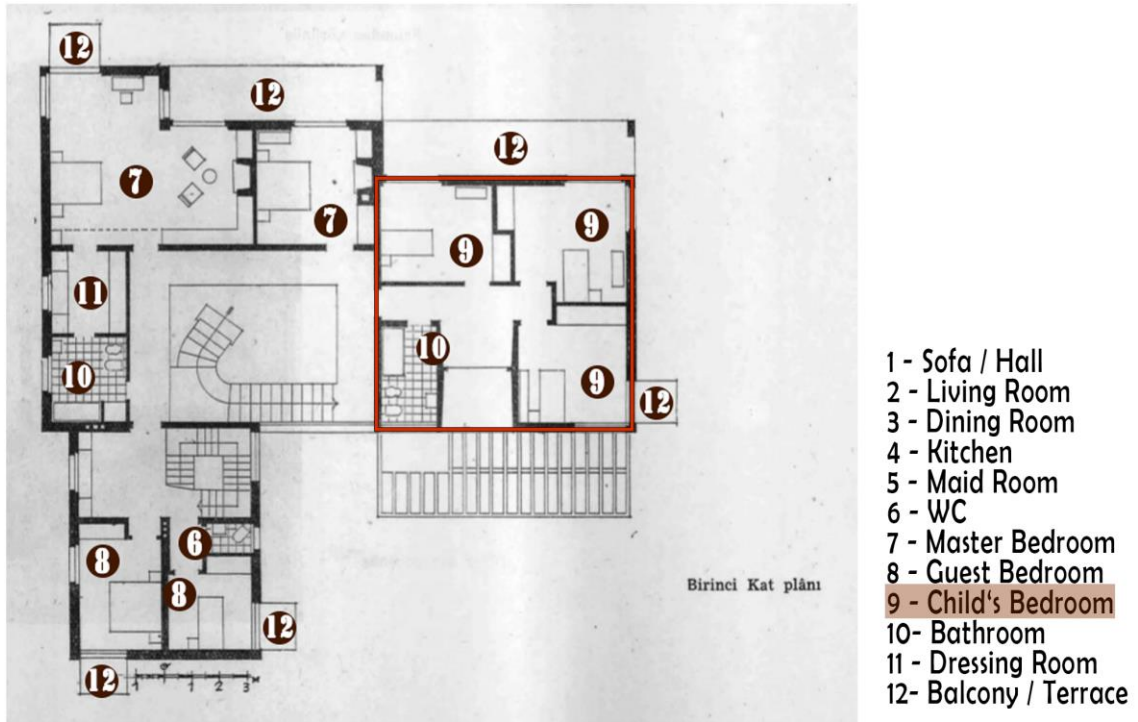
The first floor plan of Sadıkoğlu Villa, İstanbul (Arkitekt, 1956, 3)
